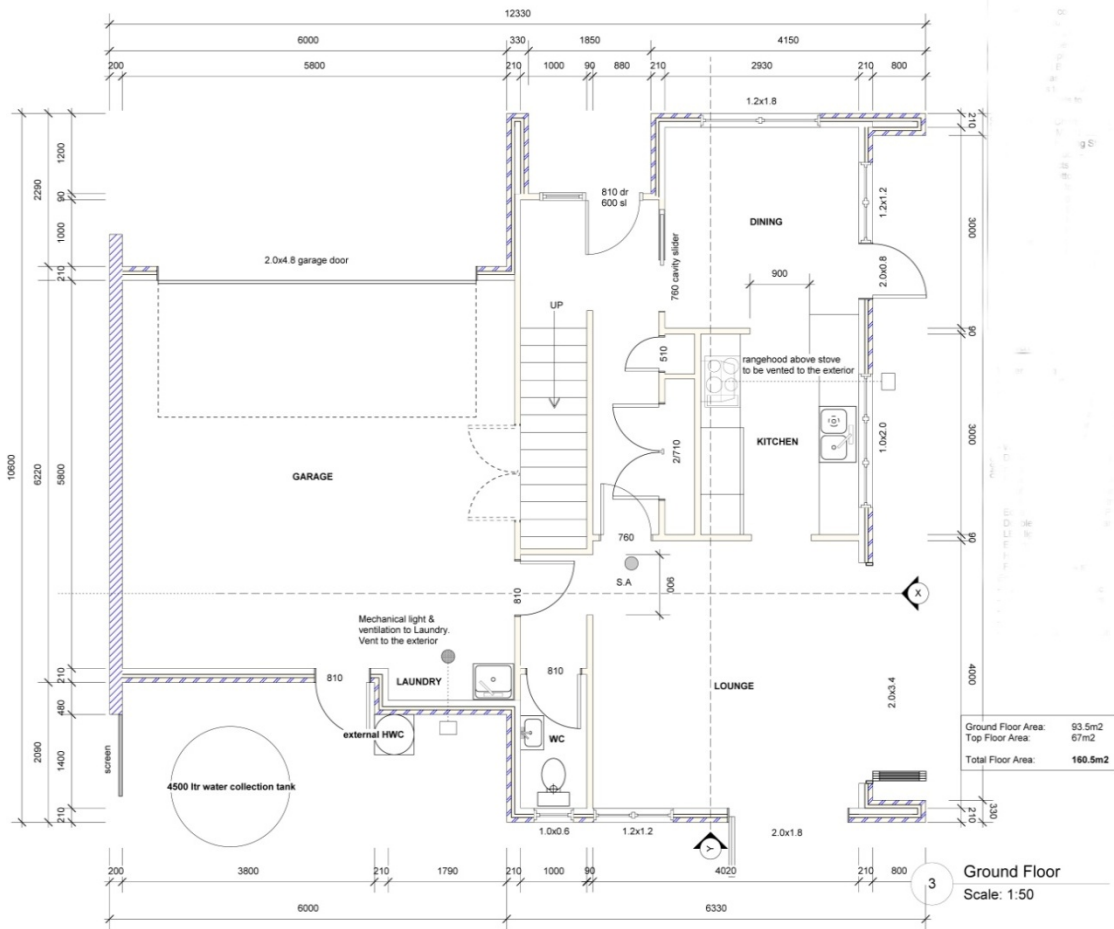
Ground Floor Plan NZHF HomeSmart Home
